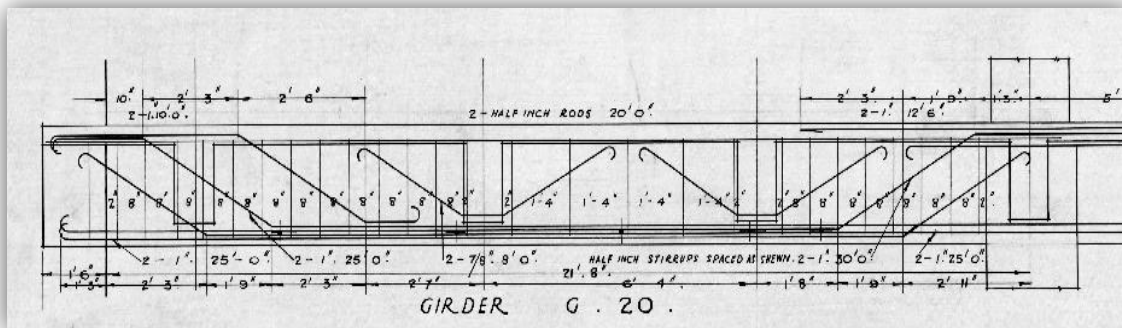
Details showing beam reinforcement (Source: Brisbane City Hall)
